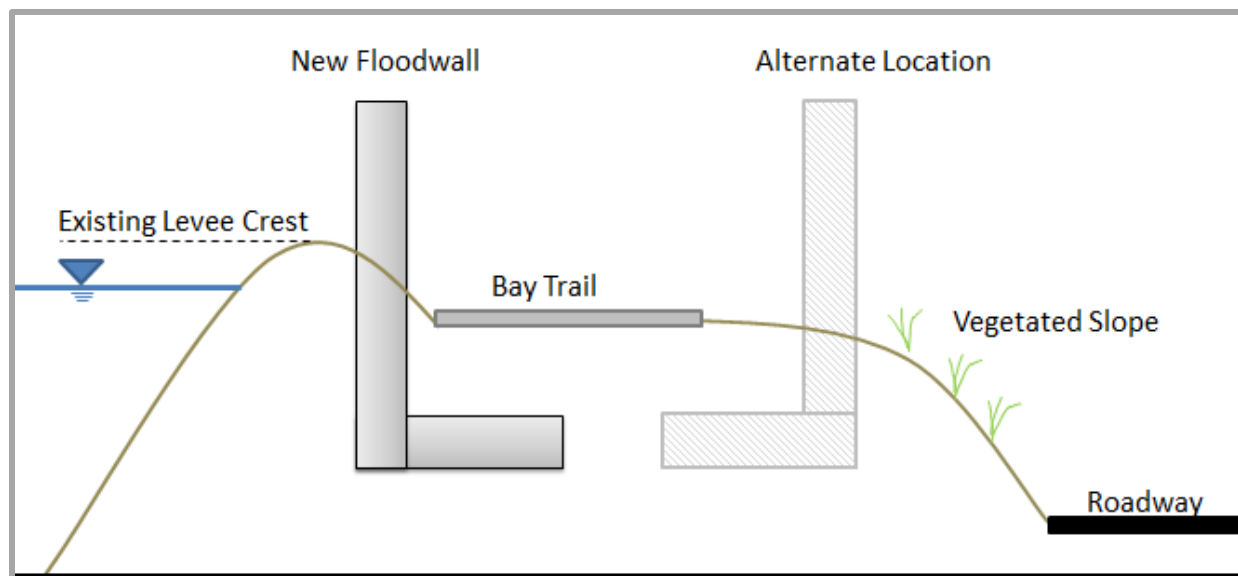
Typical Floodwall Cross Section (not drawn to scale)
